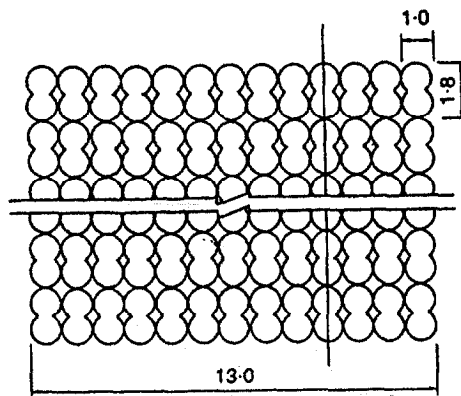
Design section for quay wall for a waste disposal plant, Japan (Kawasaki et al., 1981).
